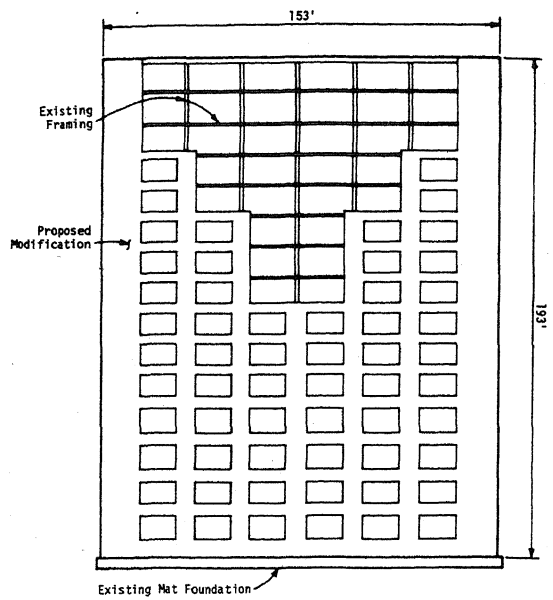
PROPOSED MODIFICATION, WEST ELEVATION
